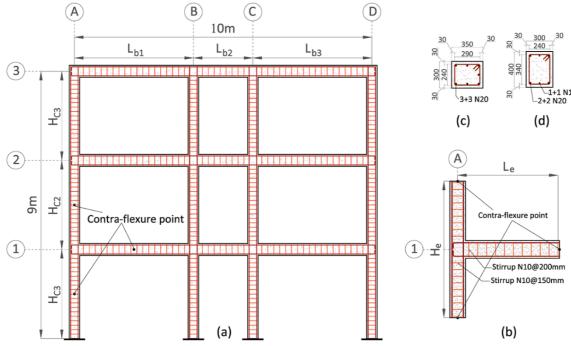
Geometry of case study model: (a) Full-scale RC moment resisting frame; (b) Exterior Beam-Column Joint; (c) Column section; (d) Beam section.
